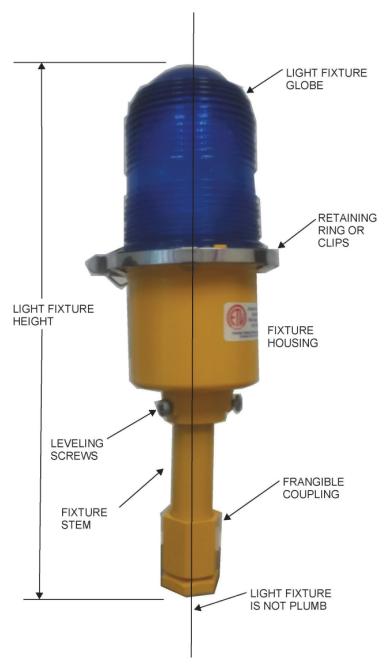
Elevated light fixture exterior inspection criteria.
